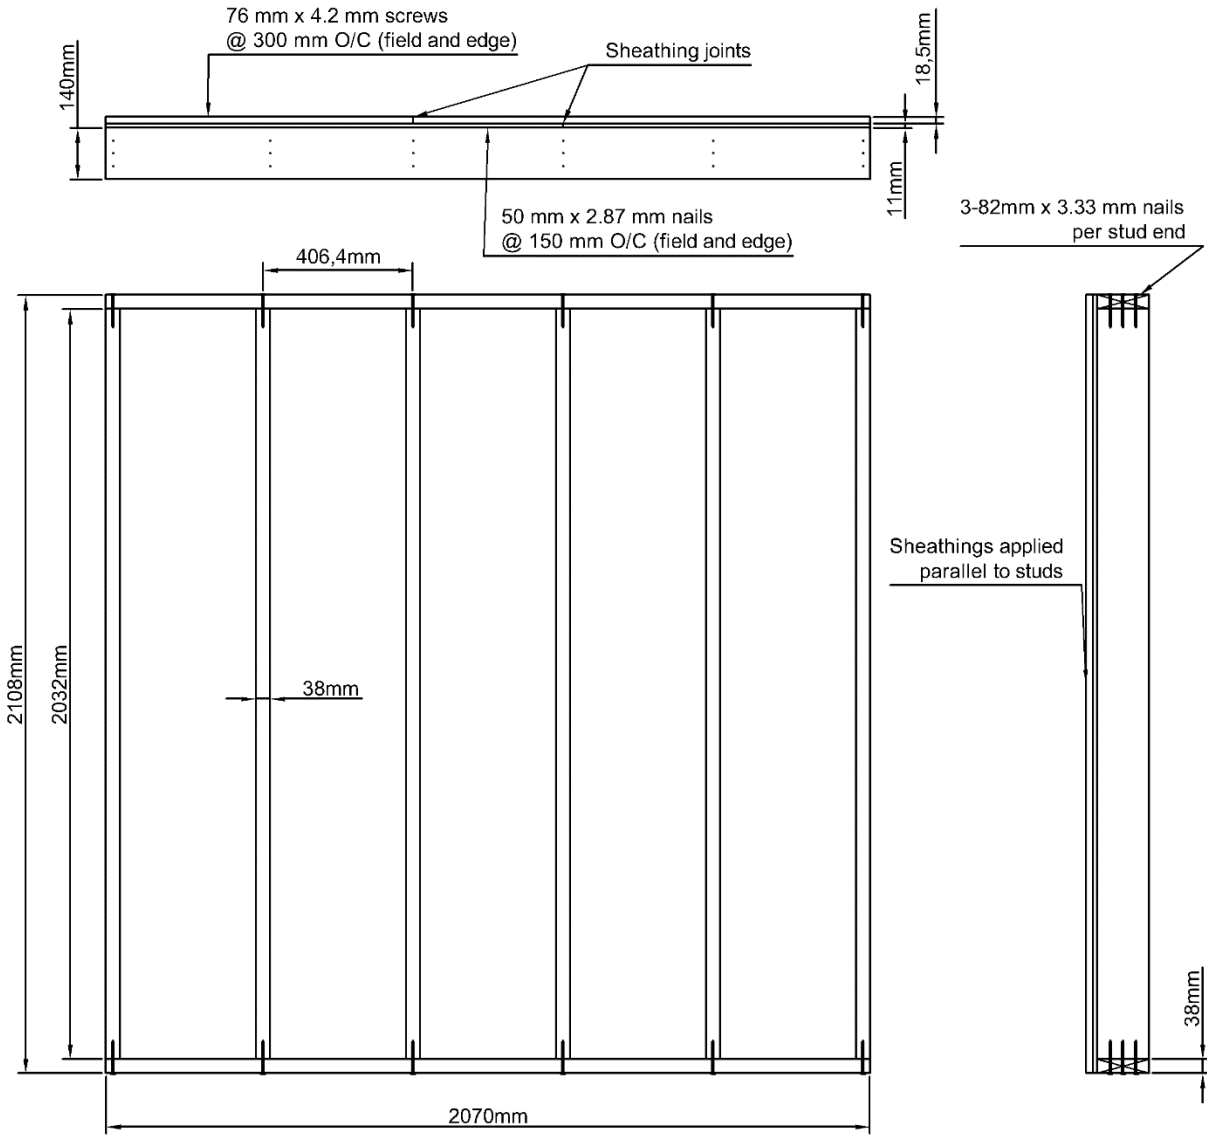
2 x 6 wall with OSB and plywood detailing
